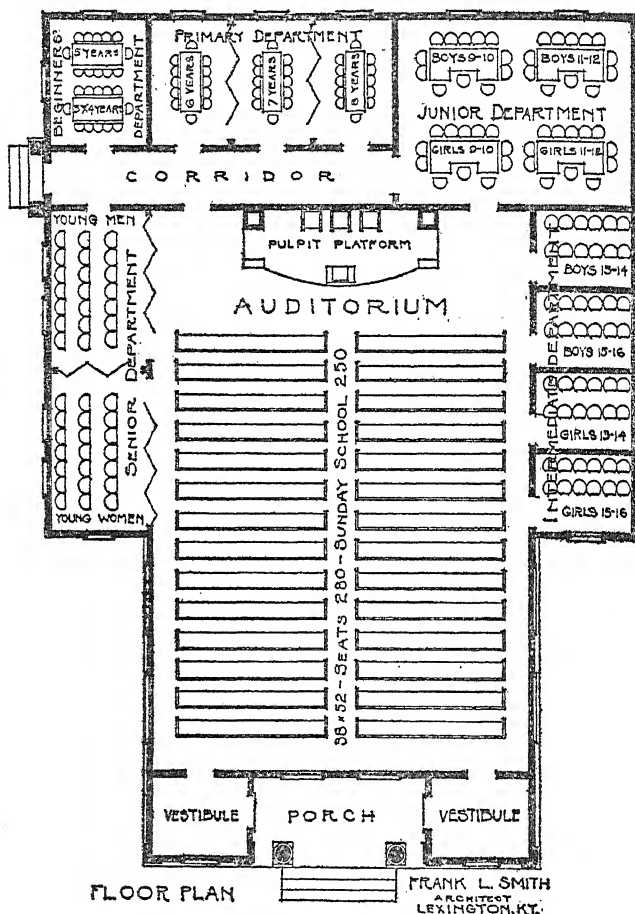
Floor plan of complete Sunday-school-church house for school numbering 150 to 250.
